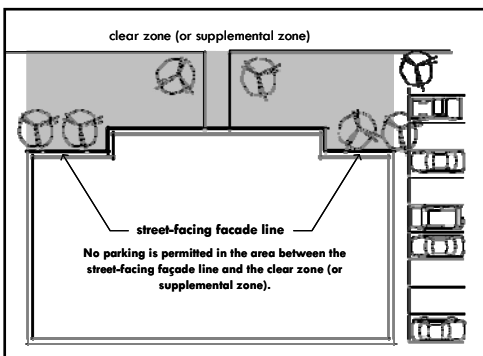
Parking to the side of a building is permitted but screening is required between the parking and the sidewalk. No parking is permitted between the building and the sidewalk on a core transit corridor.
